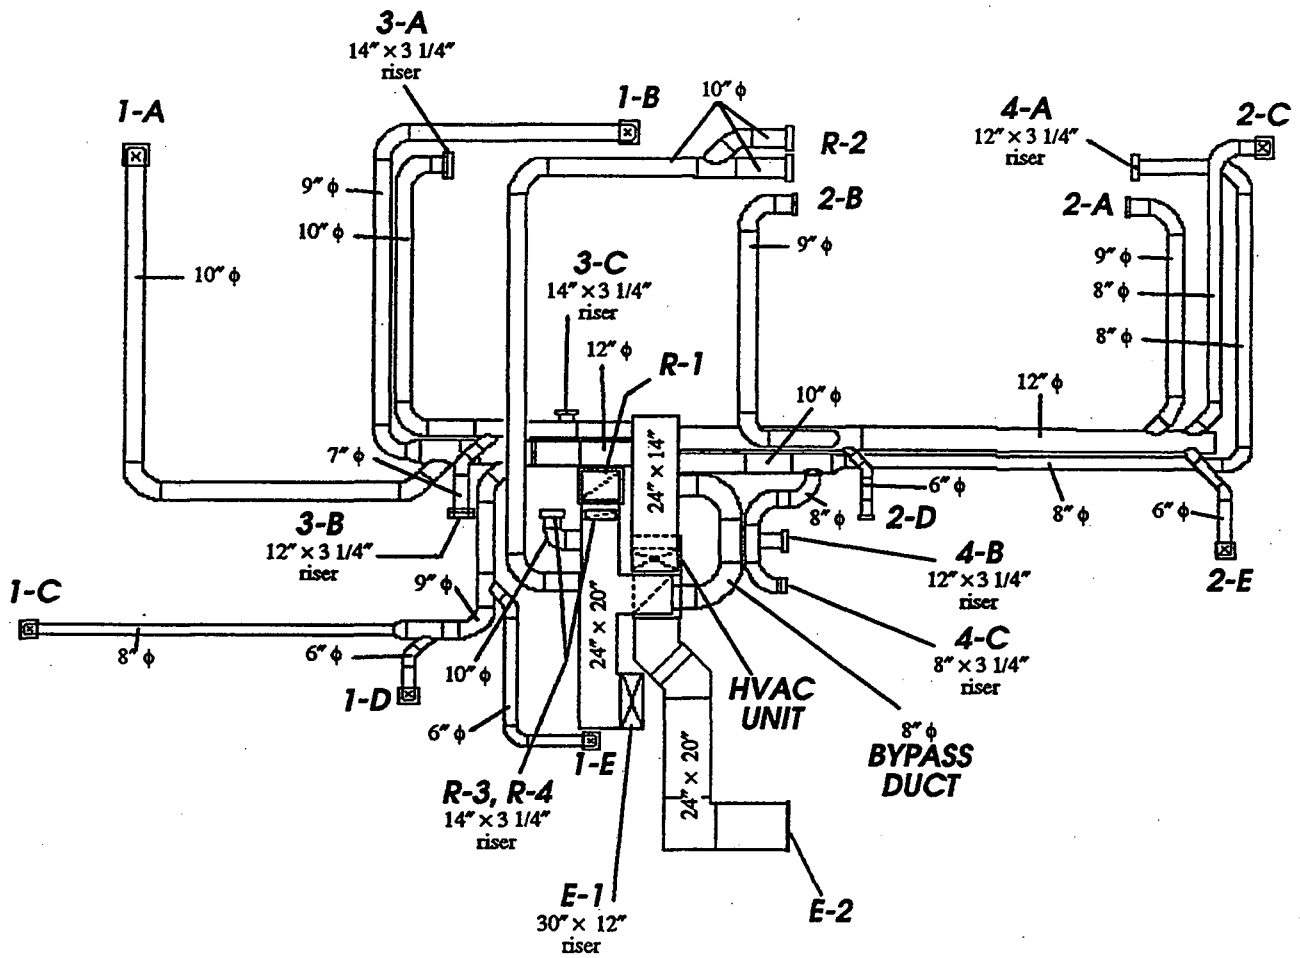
Duct system layout, location is between floors (not to scale). Register dimensions in accompanying table.
